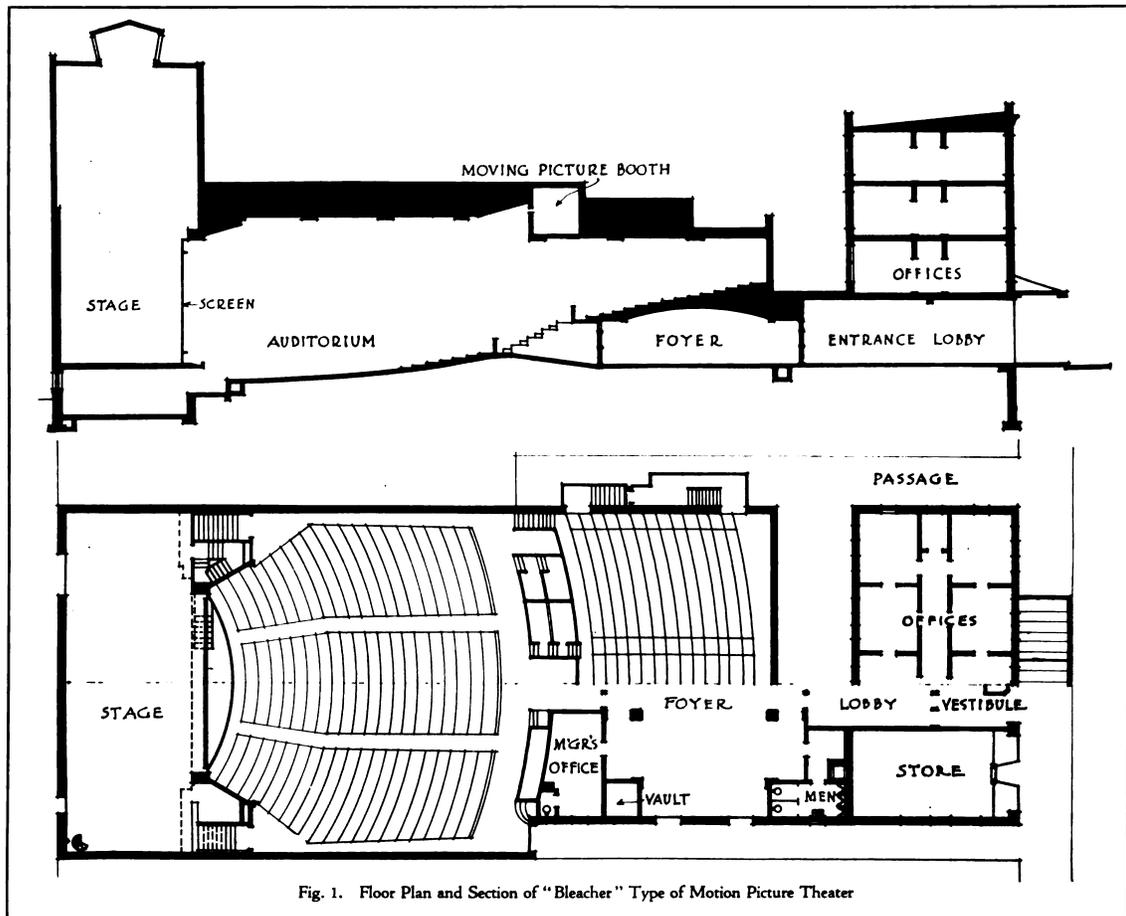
Floor Plan and Section of "Bleacher" Type of Motion Picture Theater
